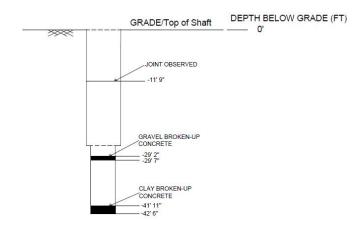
Illustration. As-built concrete coring of test drilled shaft #3.
